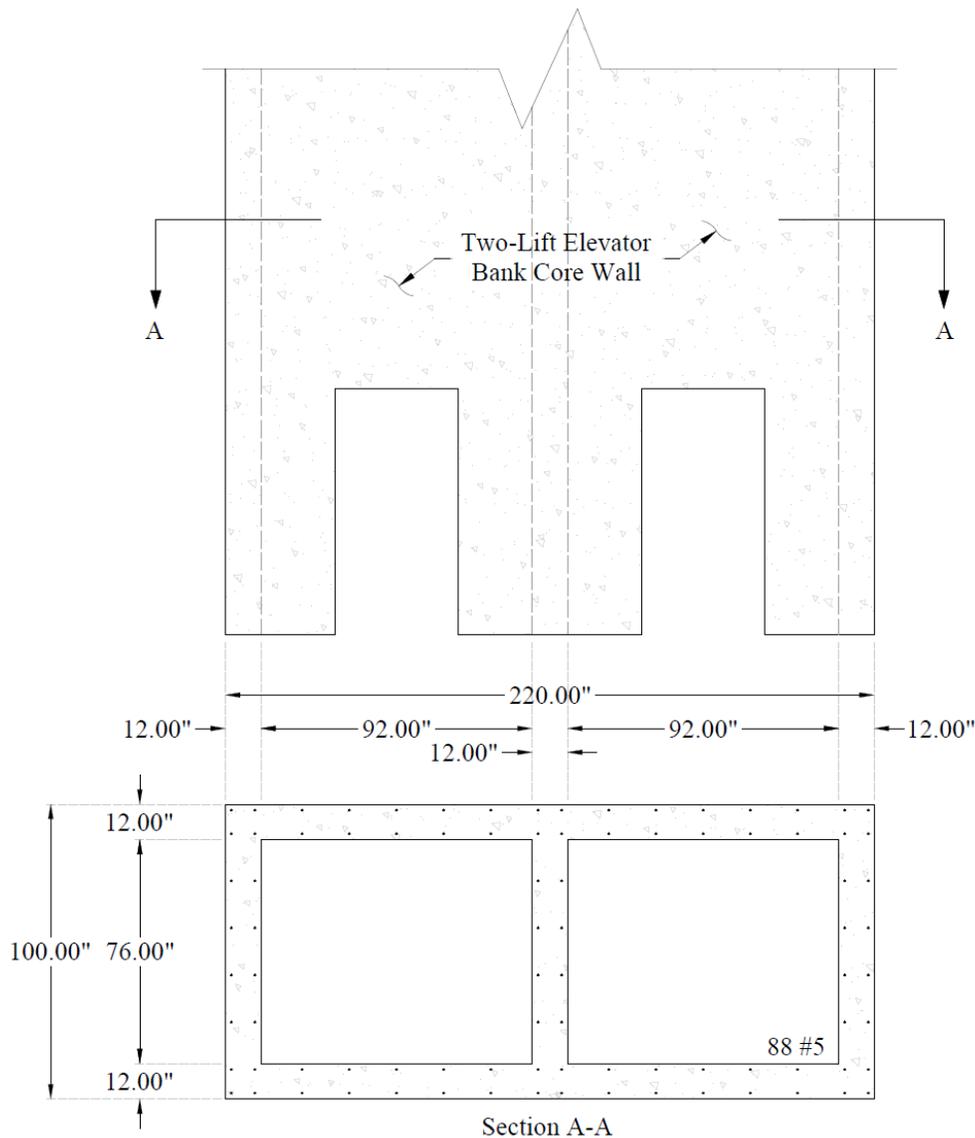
Reinforced Concrete Core Wall Cross-Section
